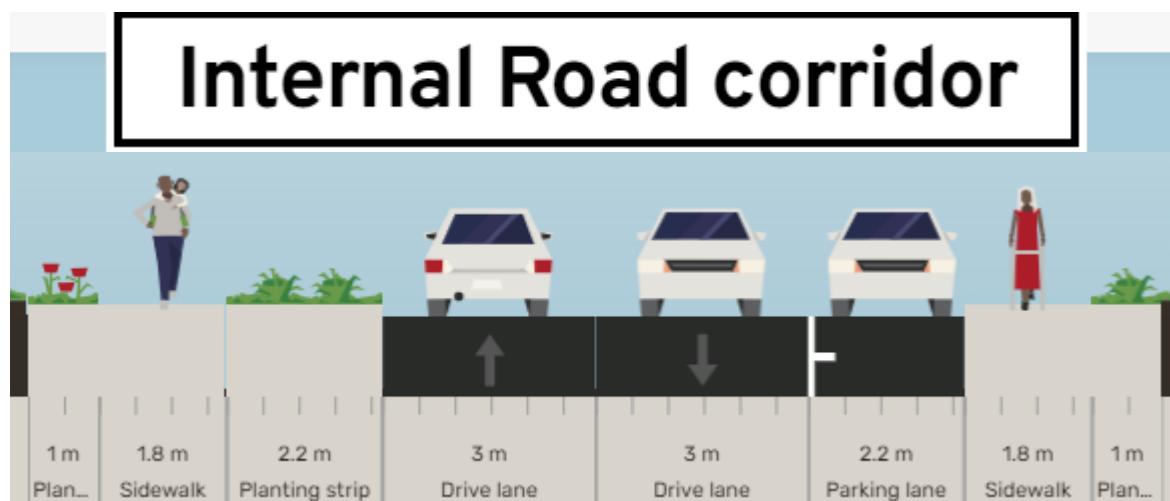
PROPOSED CROSS-SECTION OF THE INTERNAL LOCAL ROAD NETWORK
